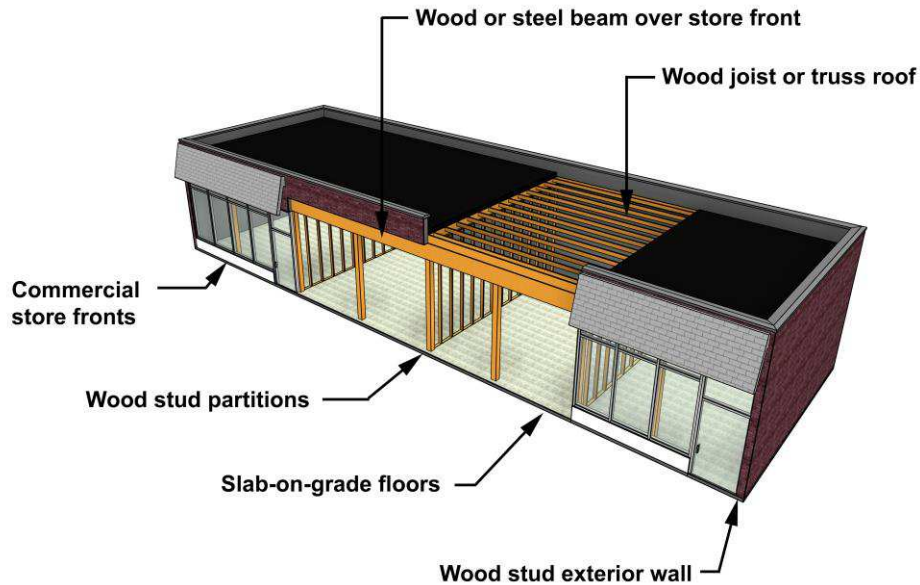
Schematic illustration of an engineered WPB building (Figure adapted from FEMA 547, FEMA, 2006)
